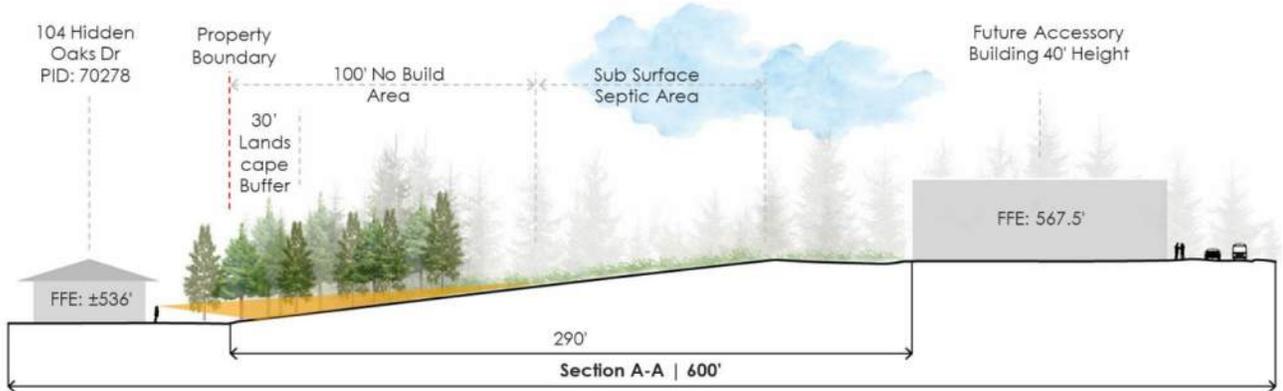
Proposed Section From Northern Parcel Boundary south through Future Accessory Building
